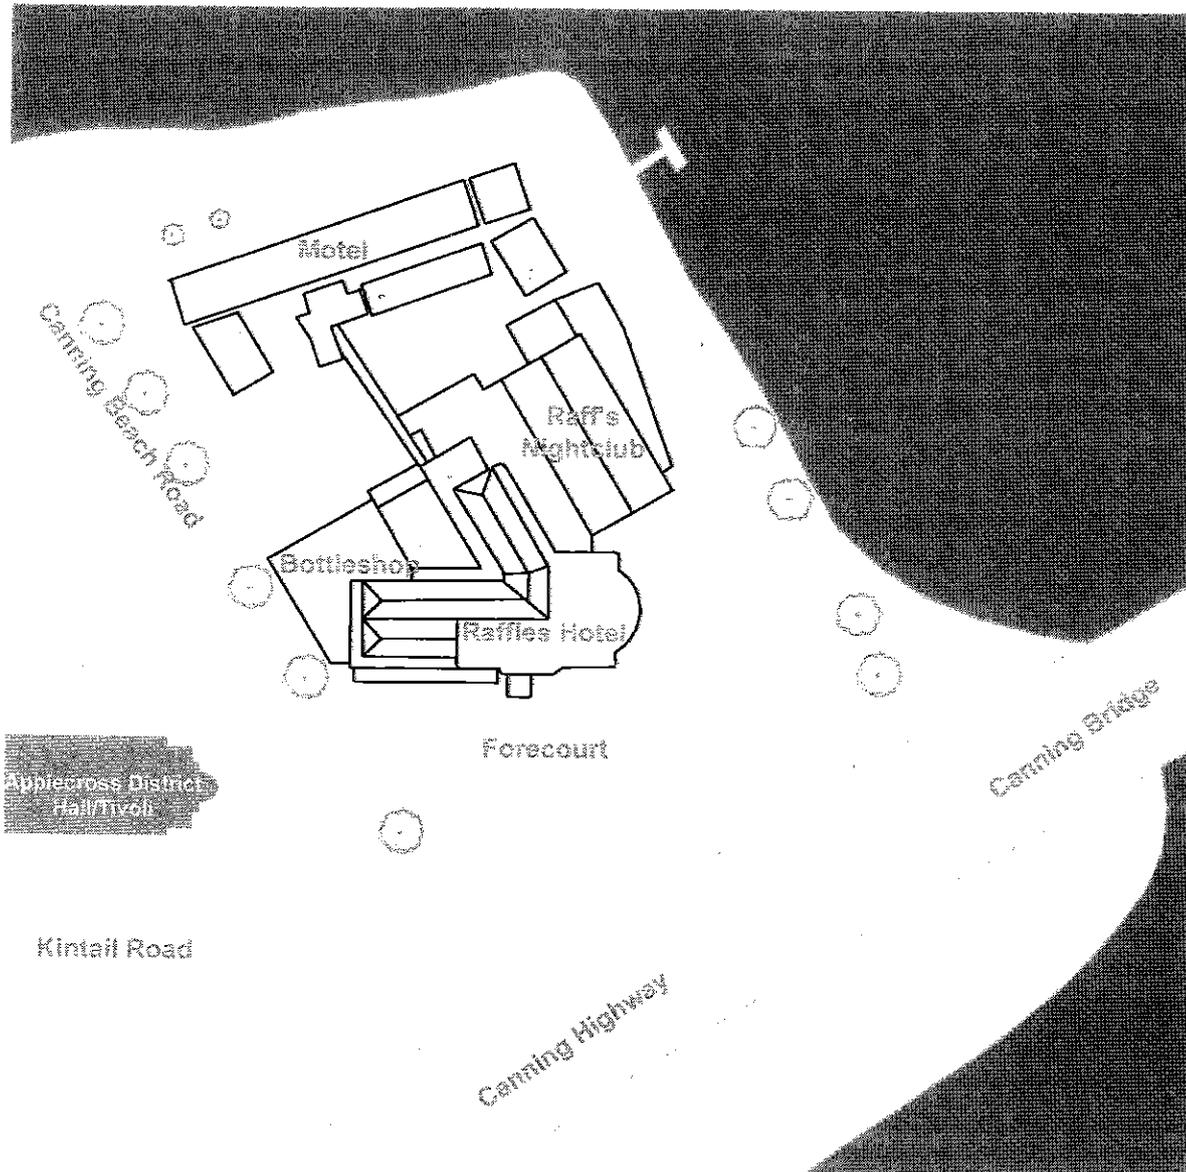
Location Plan showing the local context and site features of the study area within Raffles Hotel .
